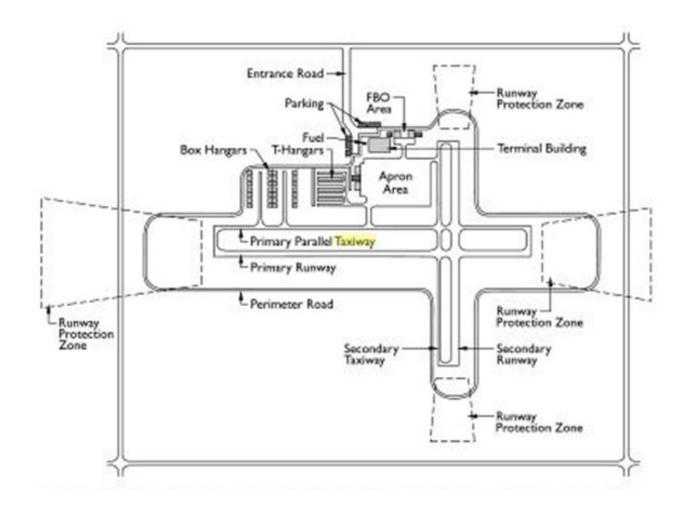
Basic Layout of an airport; Airport Layout plan. (American Planning Association, 2006)
